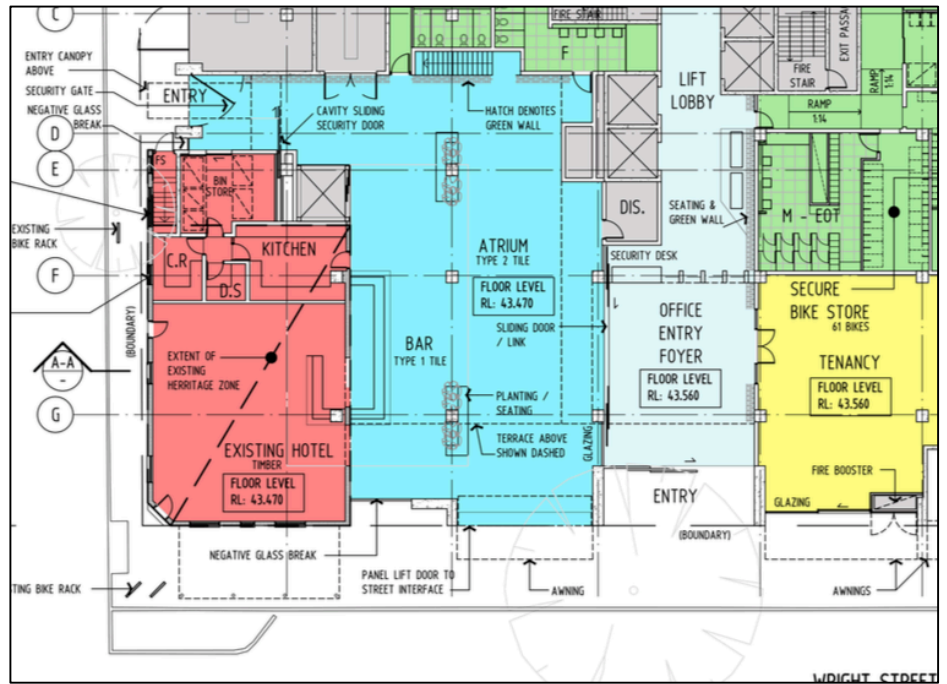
"Existing Hotel" Ground Floor retention (part drawing W076 SD04)
